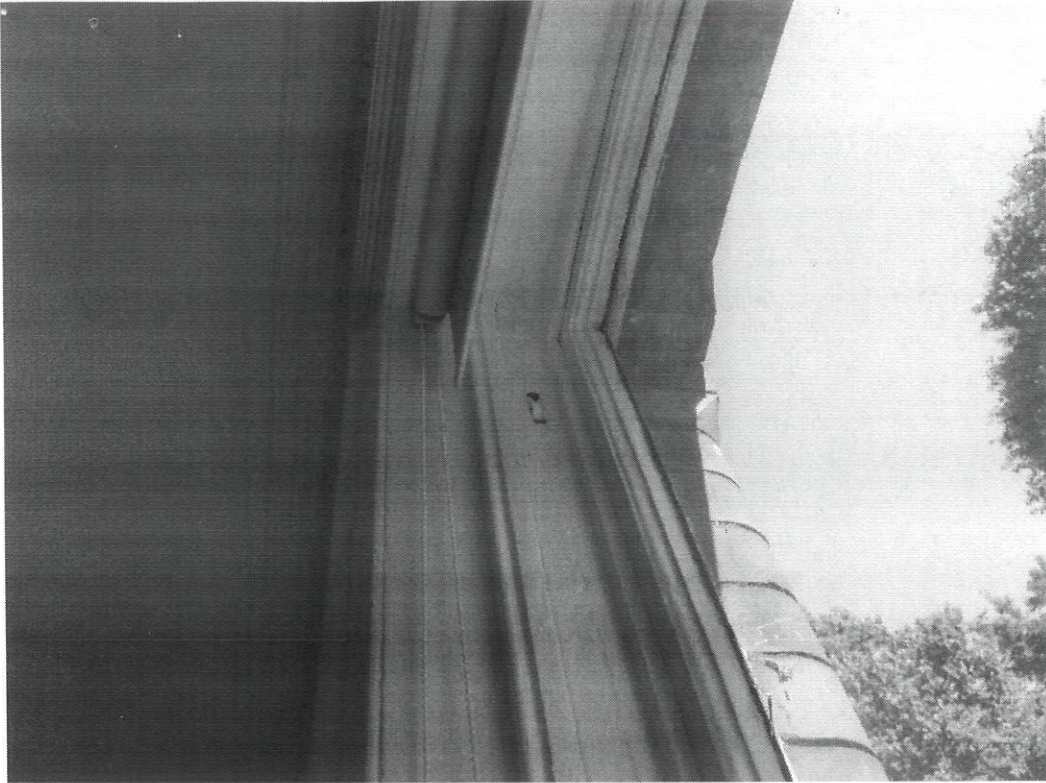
Typical window to the front, generally good condition, note missing sash cord
